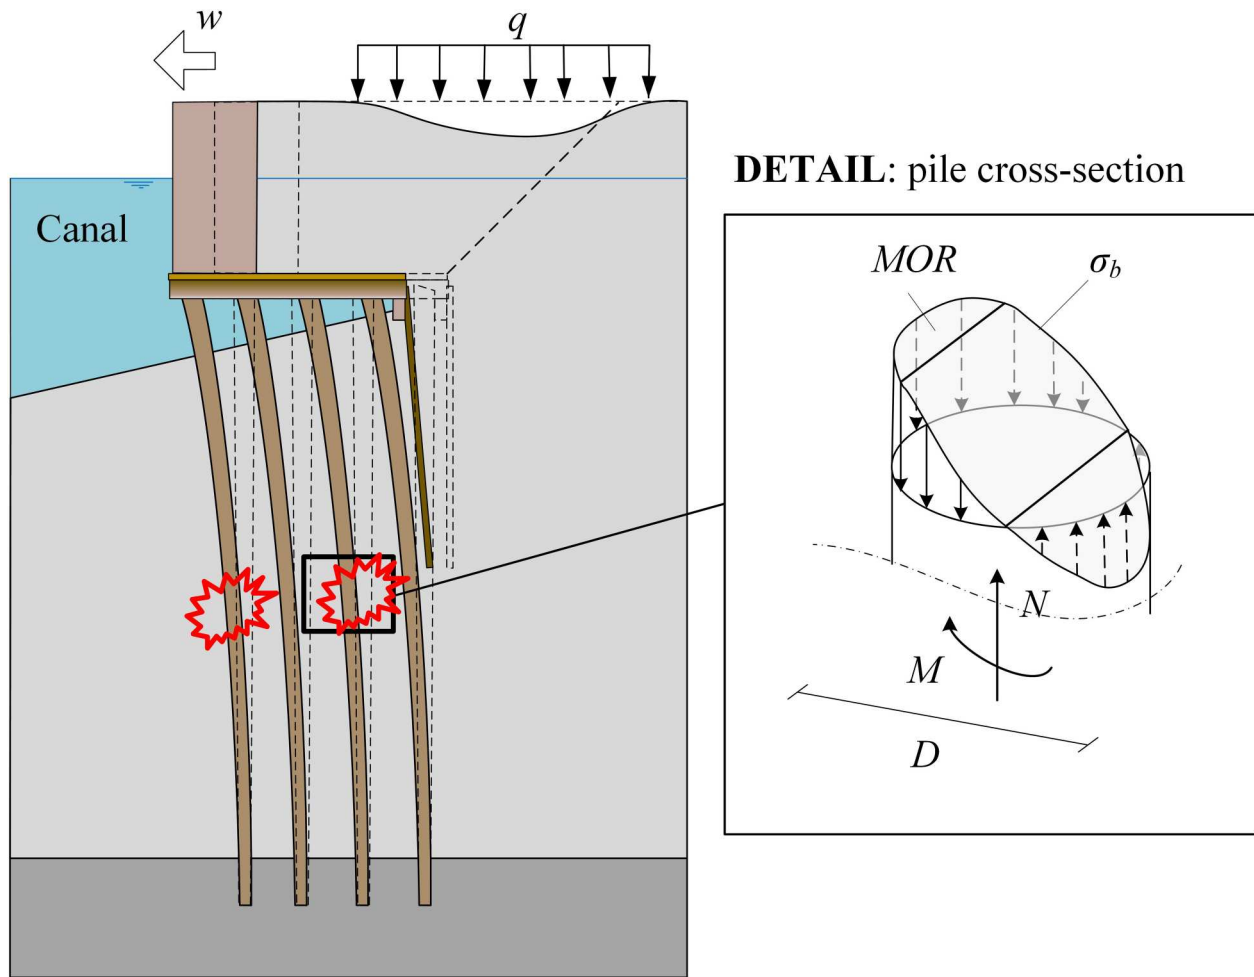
Failure mechanism “Lateral failure of the quay wall foundation”. Detail of pile cross-section is provided in which bending stresses are indicated.
